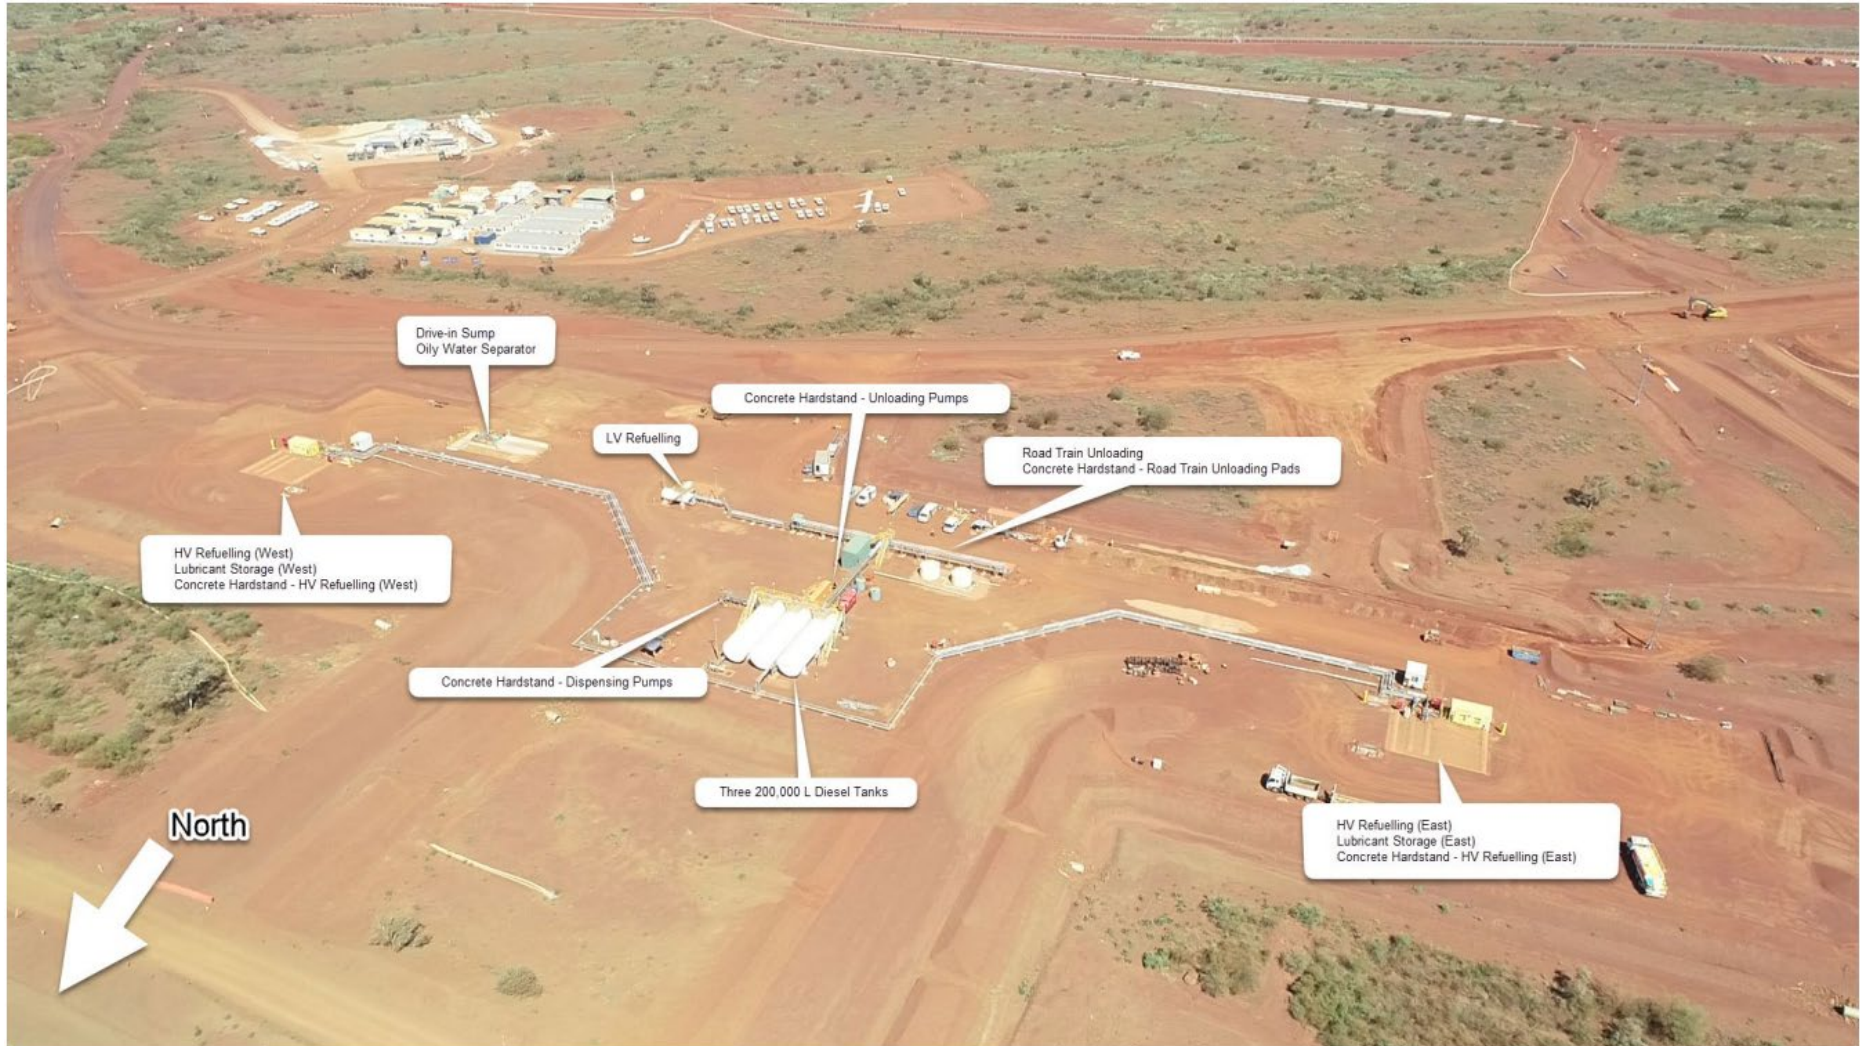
Site layout of Heavy Vehicle Refueling Facility
